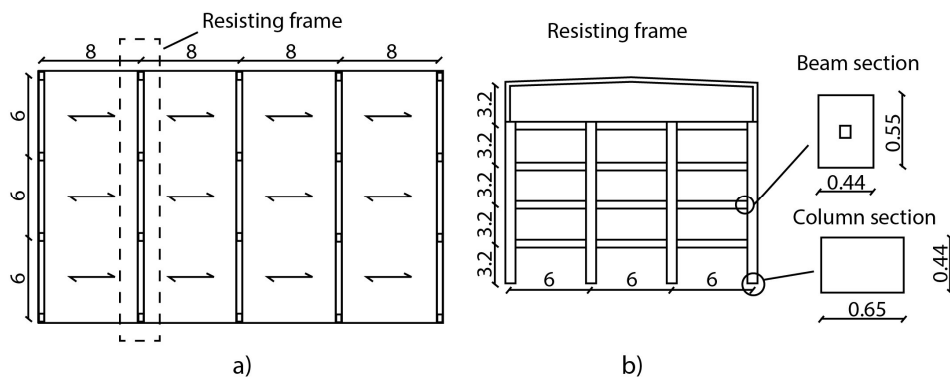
a) plan view of the floor and b) lateral view of the building and member sections.
